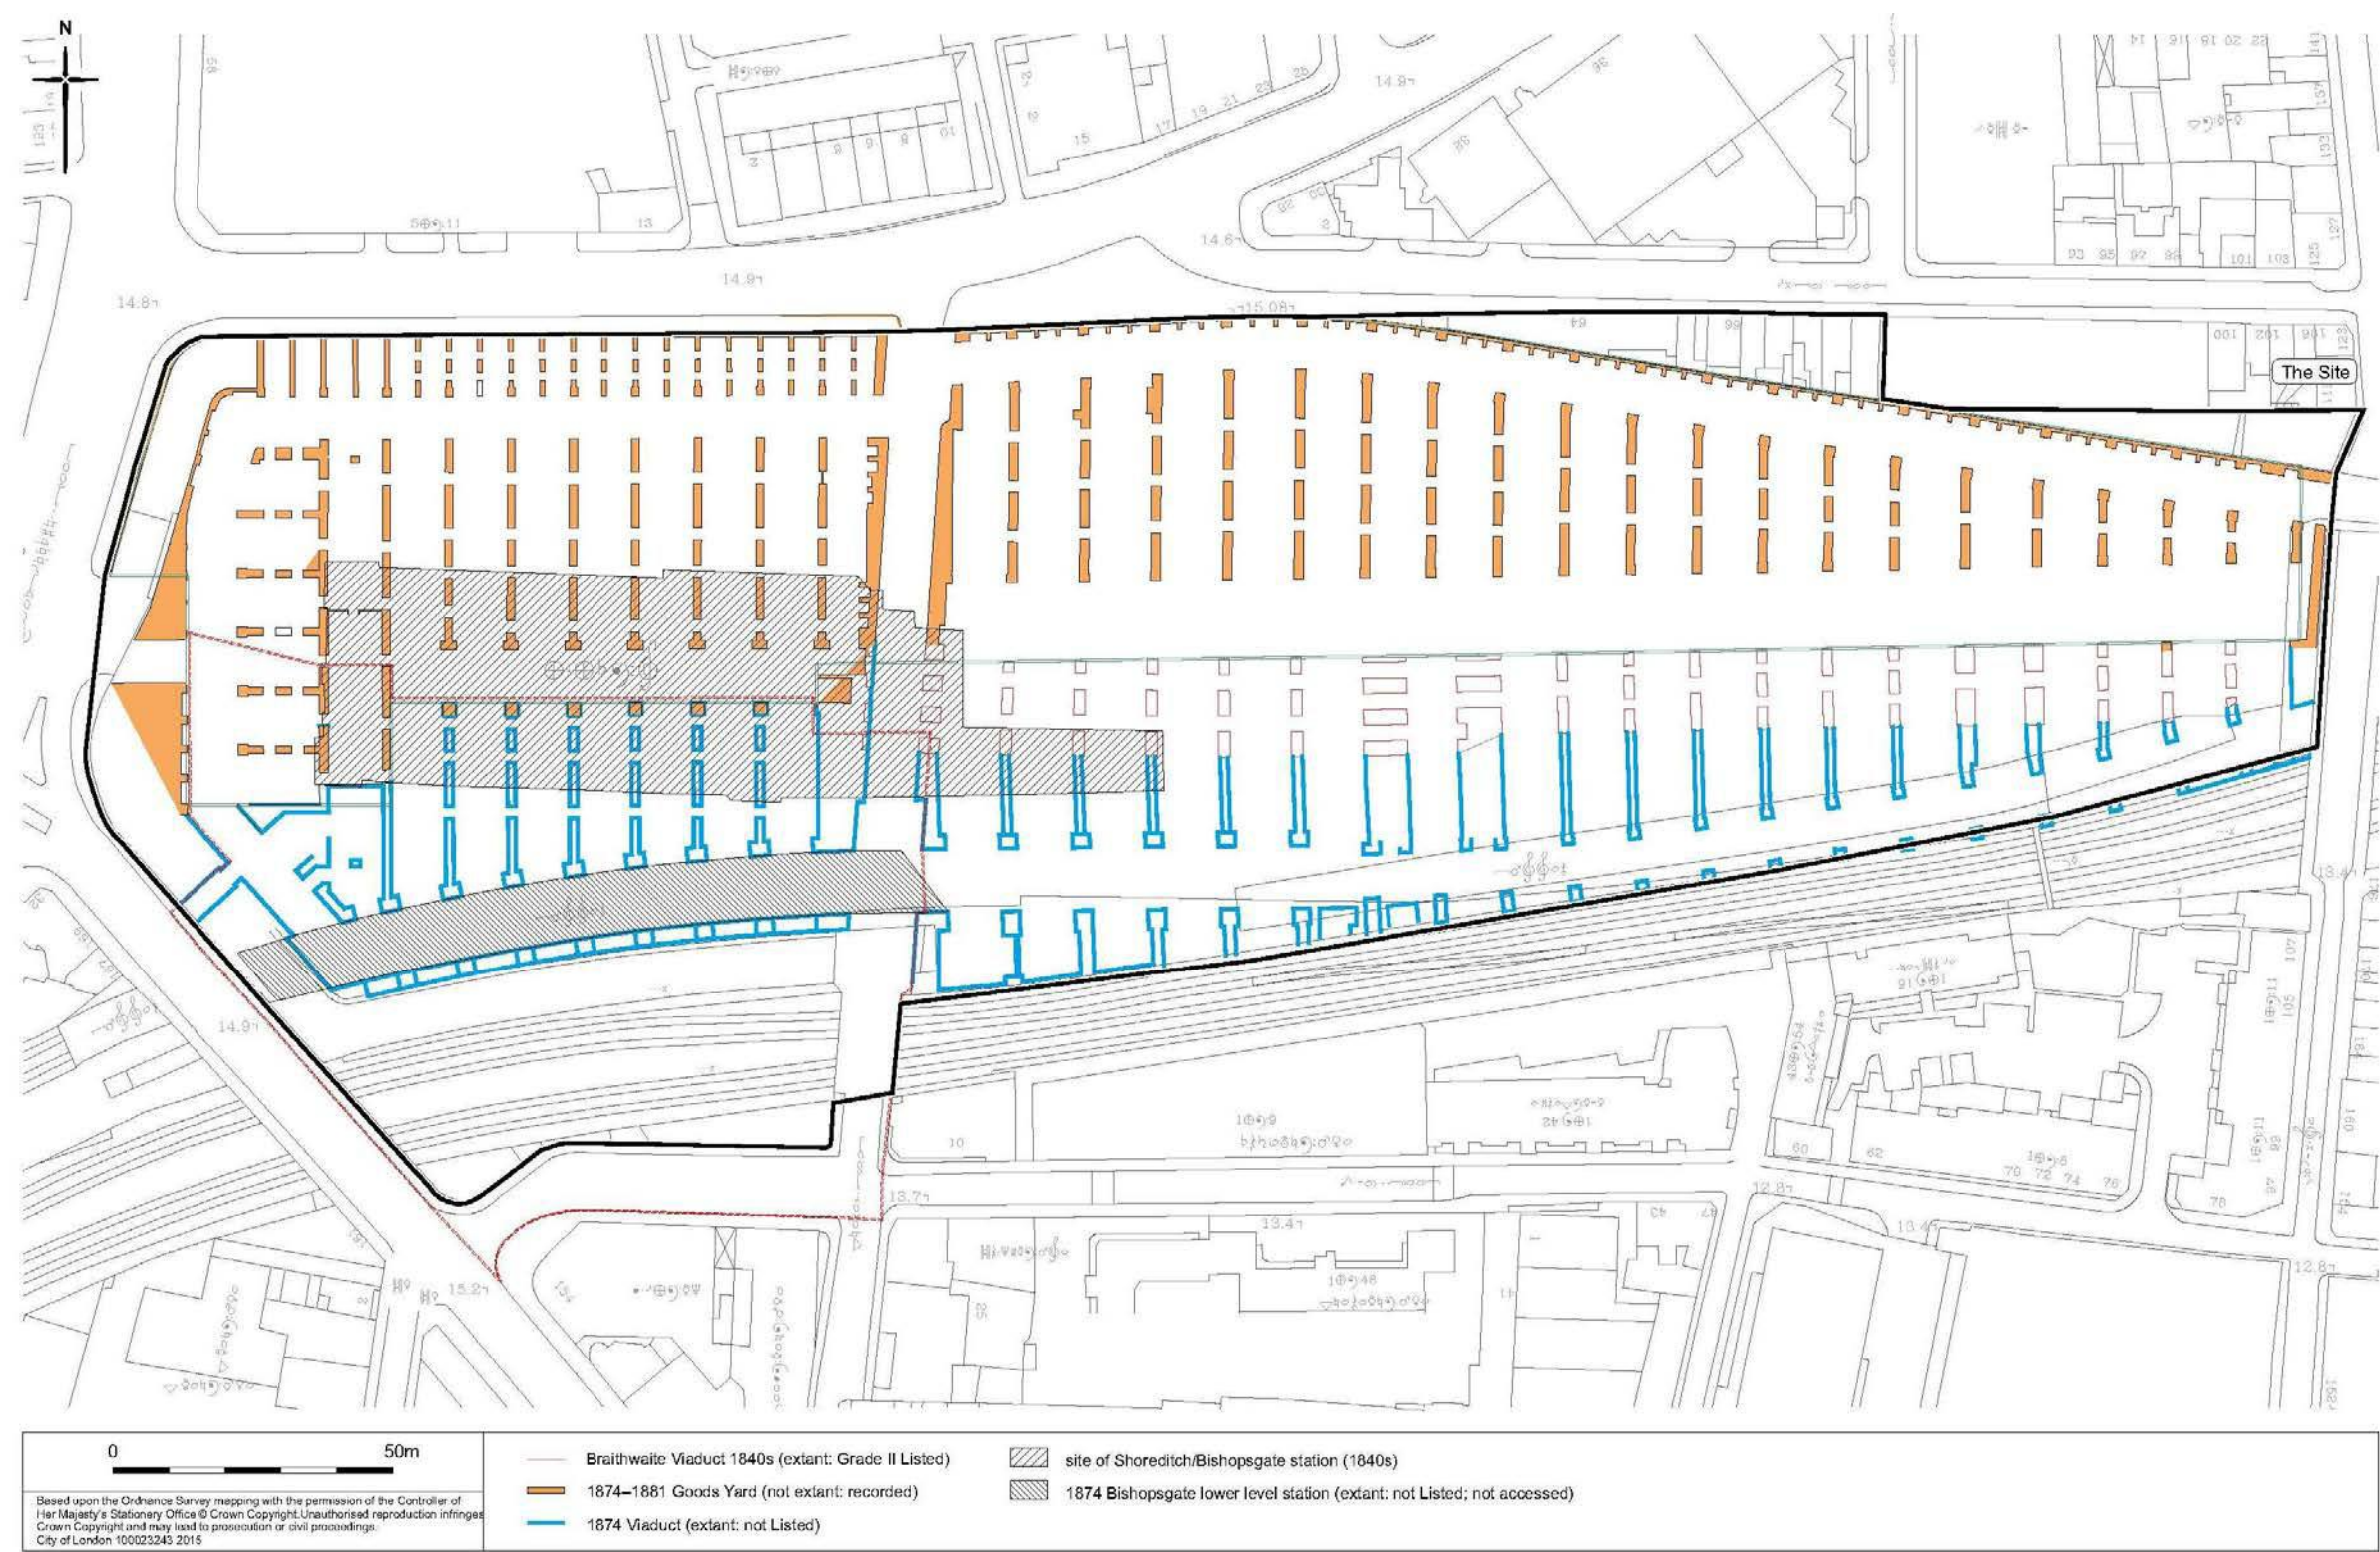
Plan of the historic railway infrastructure, above and below ground remains
